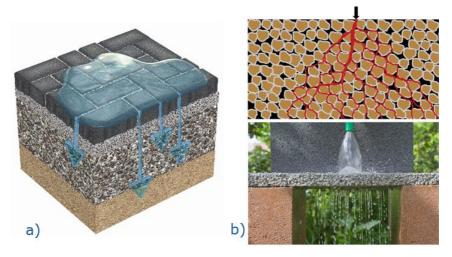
Drainage mechanisms in a) paving with permeable joints and b) pervious concrete blocks⁹⁴.
